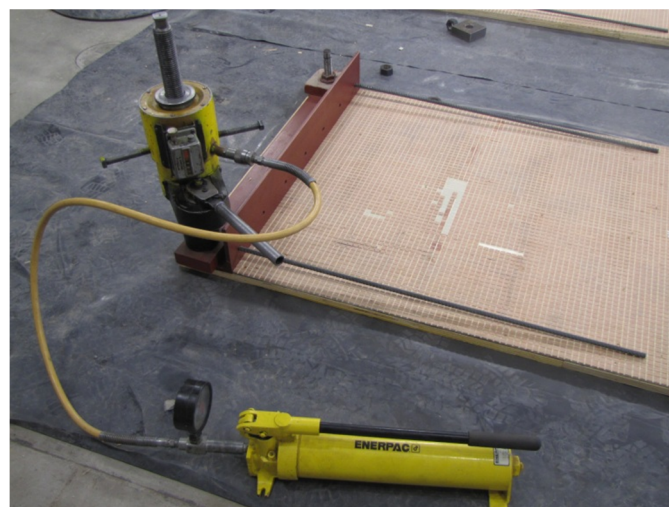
Fixing the end connections to the laboratory floor for slab-on-grade tests
